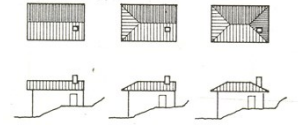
Roof types in the vernacular houses (Sümerkan,1990)
